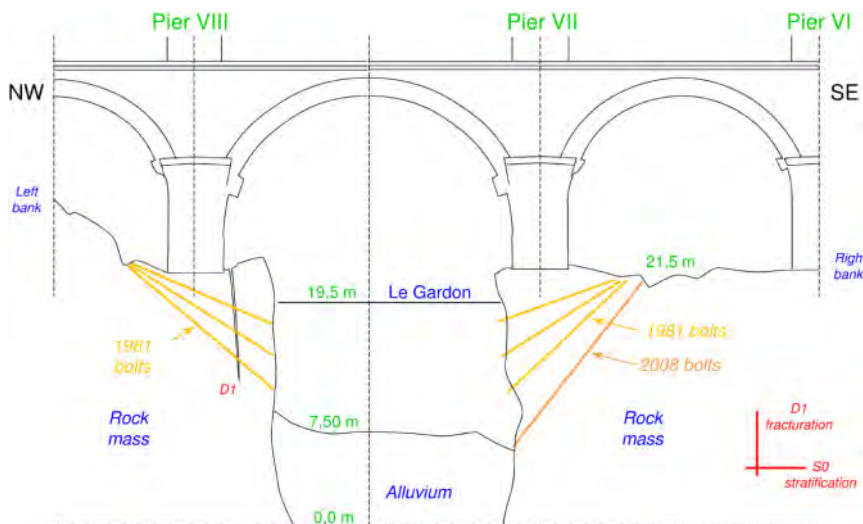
Schematic profile of the rock mass under the foundations of piers VI, VII and VIII. Principle of reinforcement by bolting. The direction of the two main families of discontinuities are indicated in red. View from upstream to downstream.
